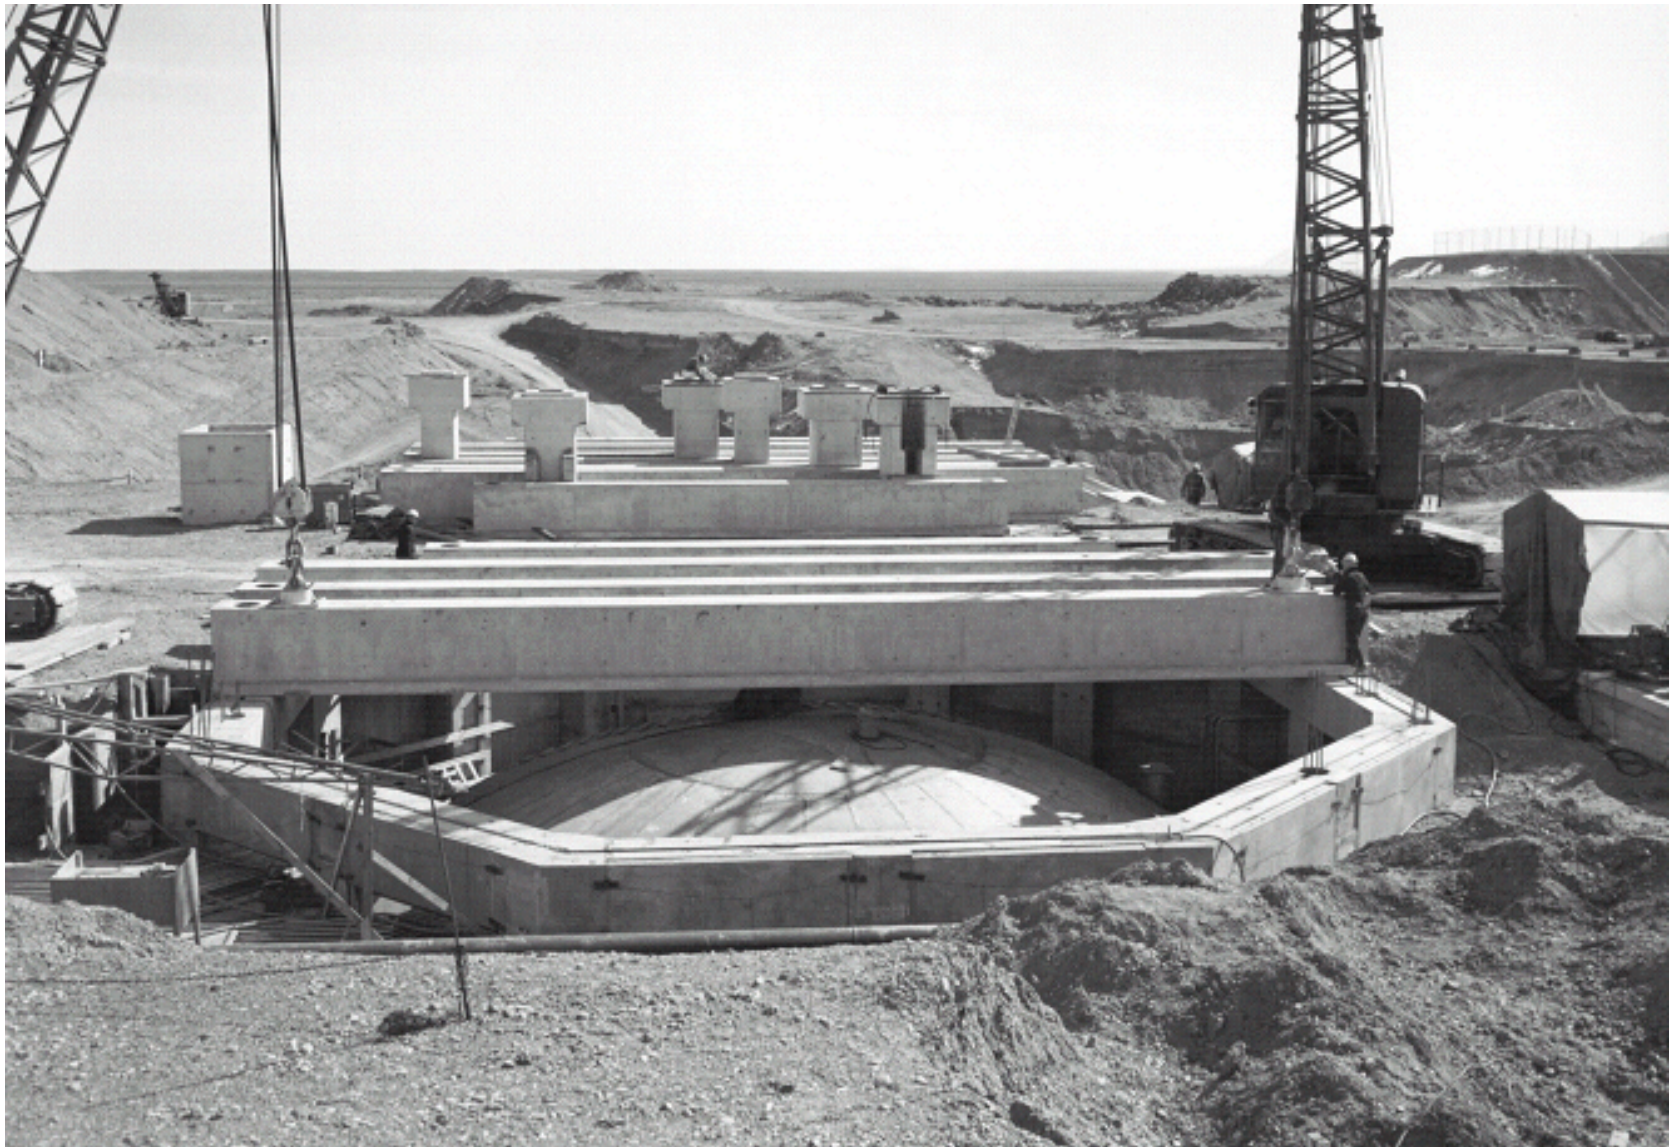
Setting roof beams in place on the WM-185 vault (the dome of Tank WM-185 is visible within the vault). (58-1221)
